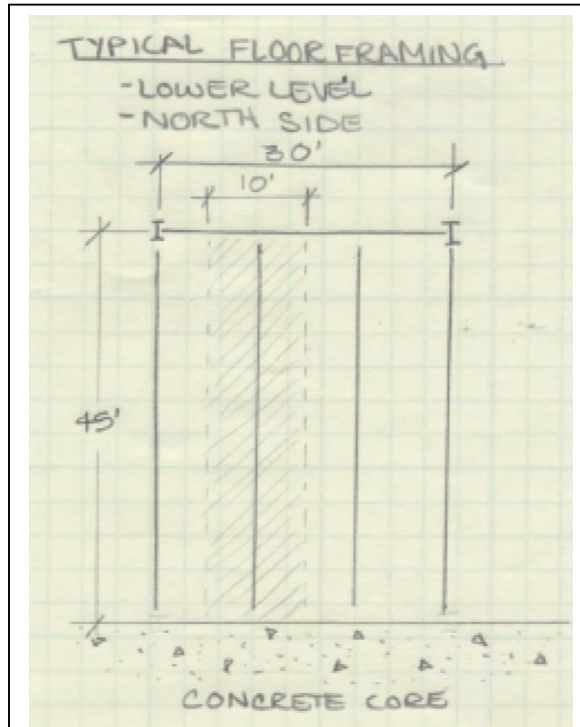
TYPICAL FRAMING OF TYPICAL BAY
